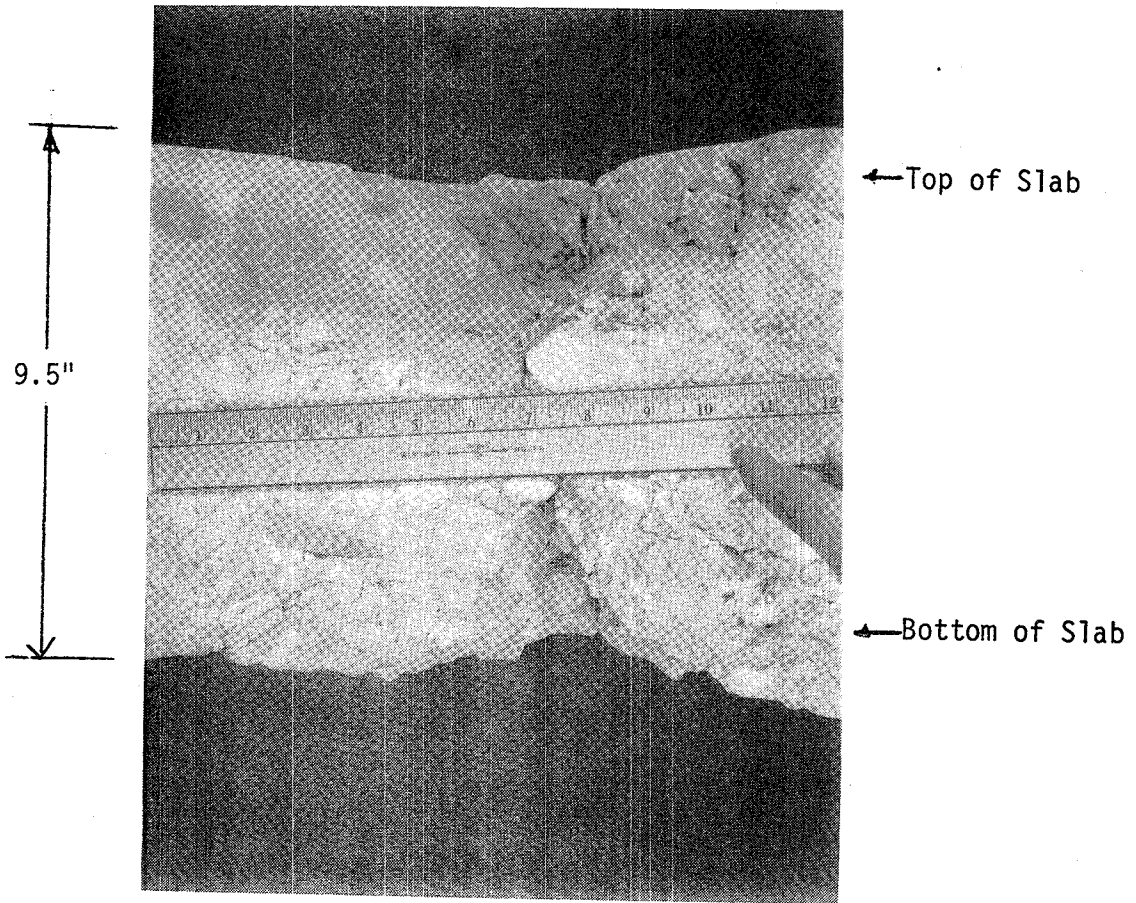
Joint cut from 17-year concrete pavement (JRCP-7-IL) showing serious concrete deterioration.
